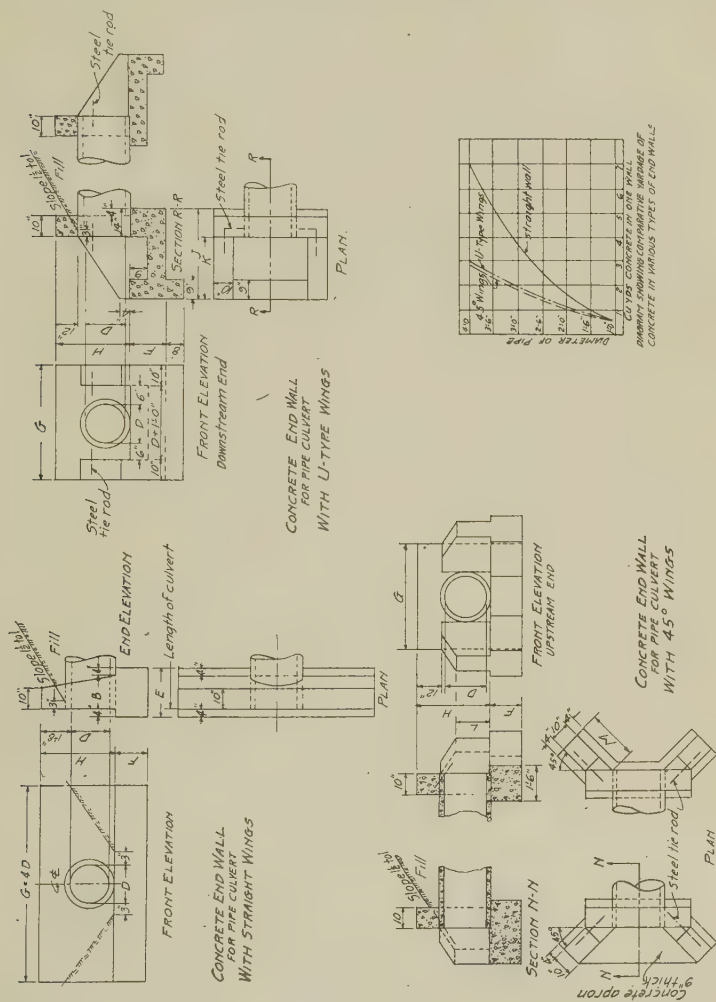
PIPE CULVERT AND END WALLS AS DESIGNED BY THE STATE HIGHWAY DEPARTMENT OF OKLAHOMA.
